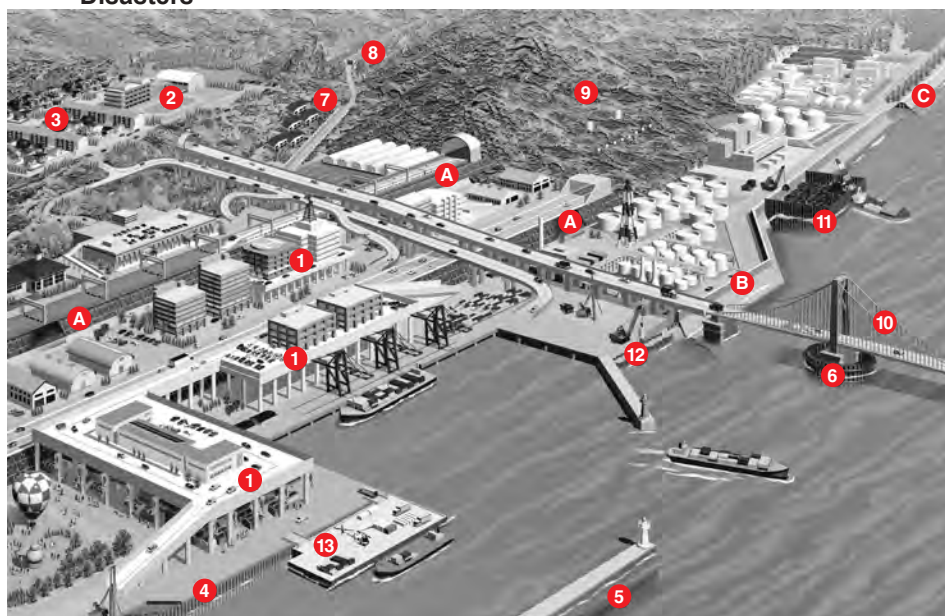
Type of Corrosion-protection Measures for Port/Harbor Steel Structures
